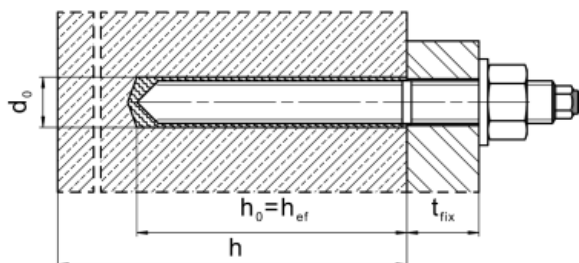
Threaded rod, HAS..., HAS-U-..., HIT-V-..., AM...8.8, with Hilti Filling Set...
